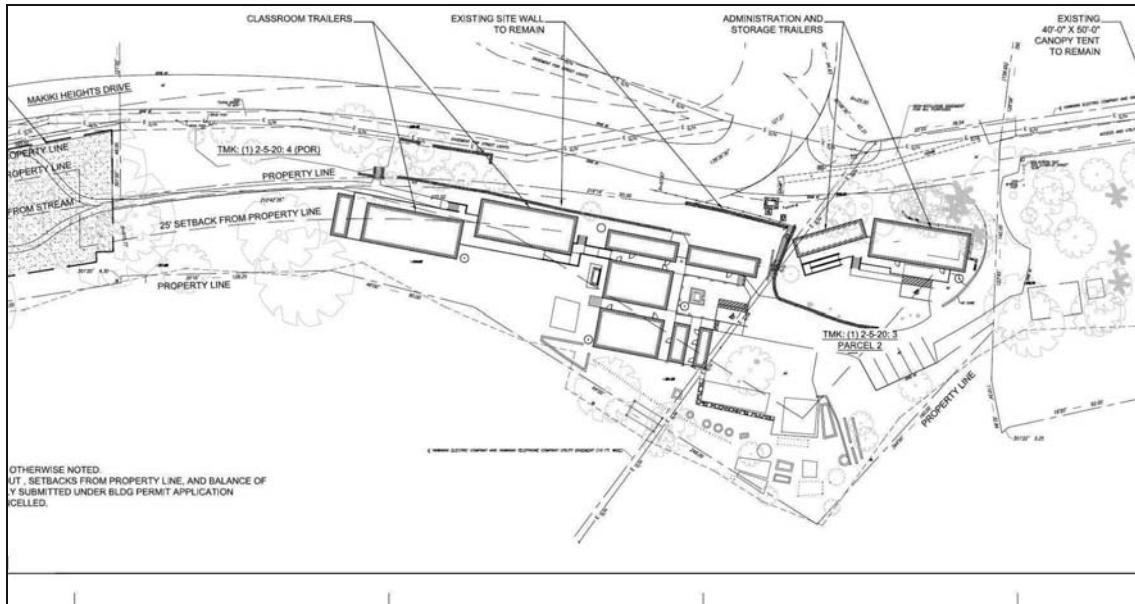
Plan View of Site -7552 in Red. Construction Plans Courtesy of Mason Architects.
